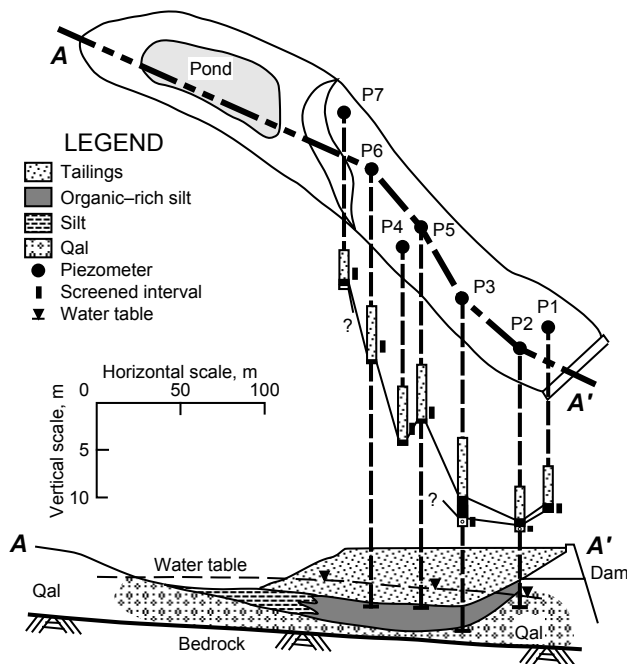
Plan view of primary impoundment and cross section of the tailings impoundment.
